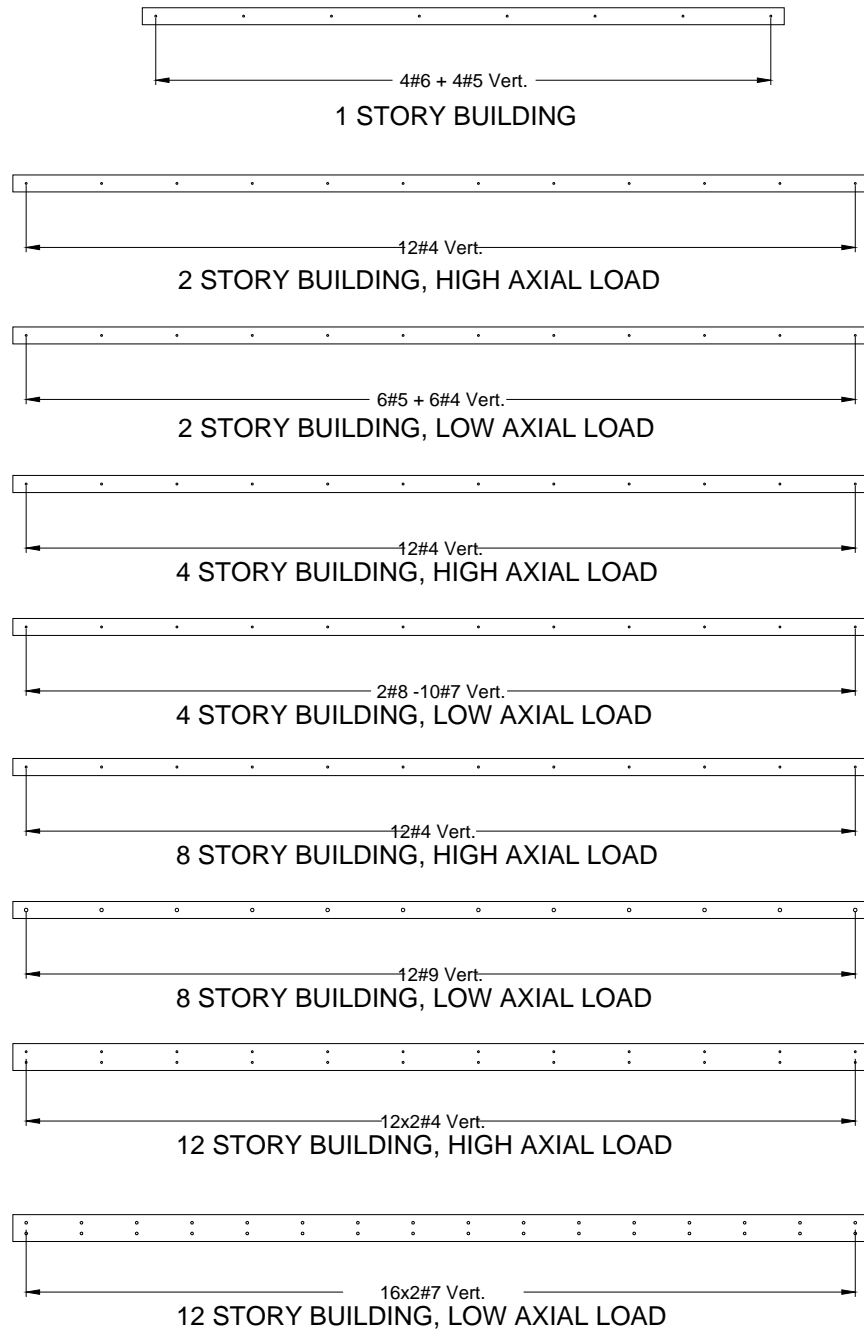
Plan sections of fully grouted special reinforced masonry shear walls, SDC D<sub>min</sub>.
